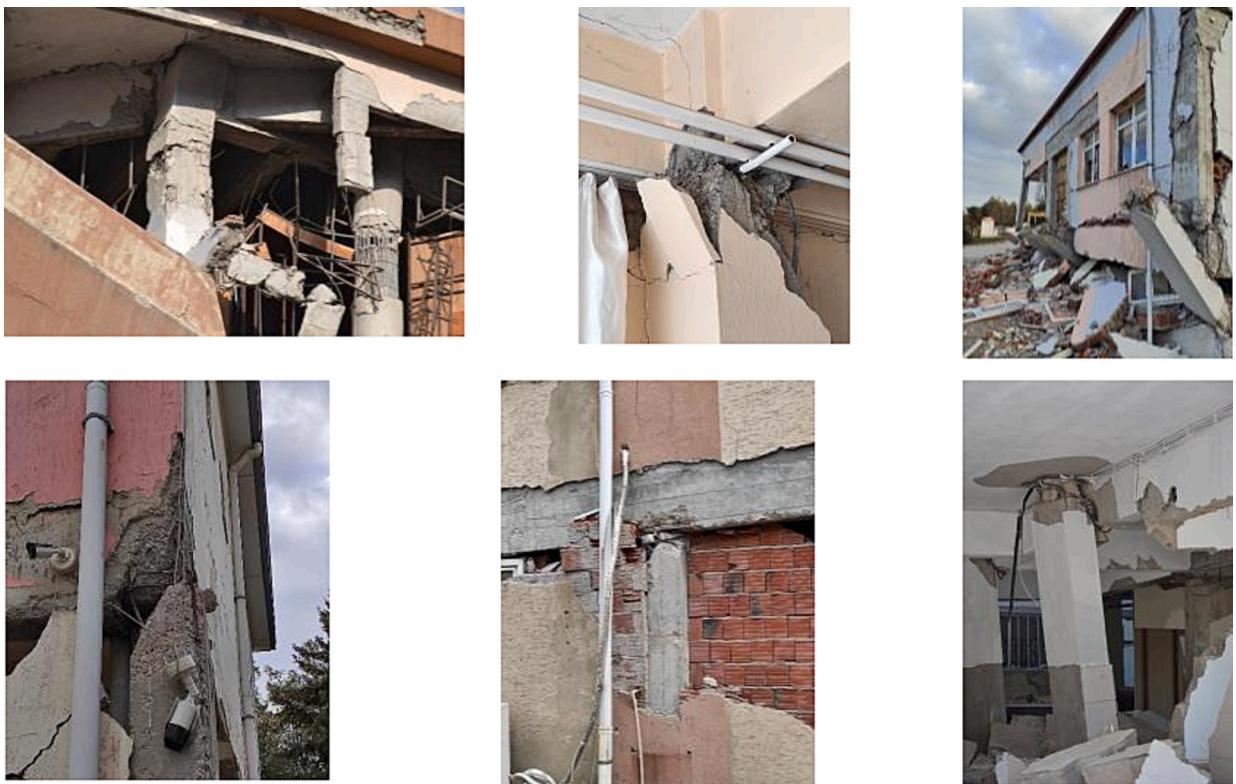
Some strong-beam weak-column damages in Hatay-Antakya and K.Maraş.
